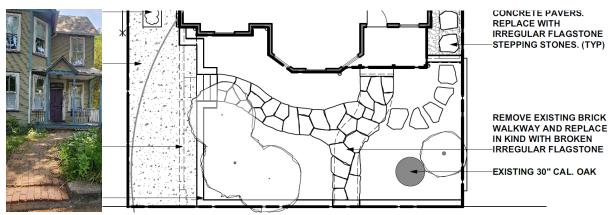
View of the existing non-historic brick path and site plan showing the proposed flagstone path. Source: Montgomery Planning and Applicant.
